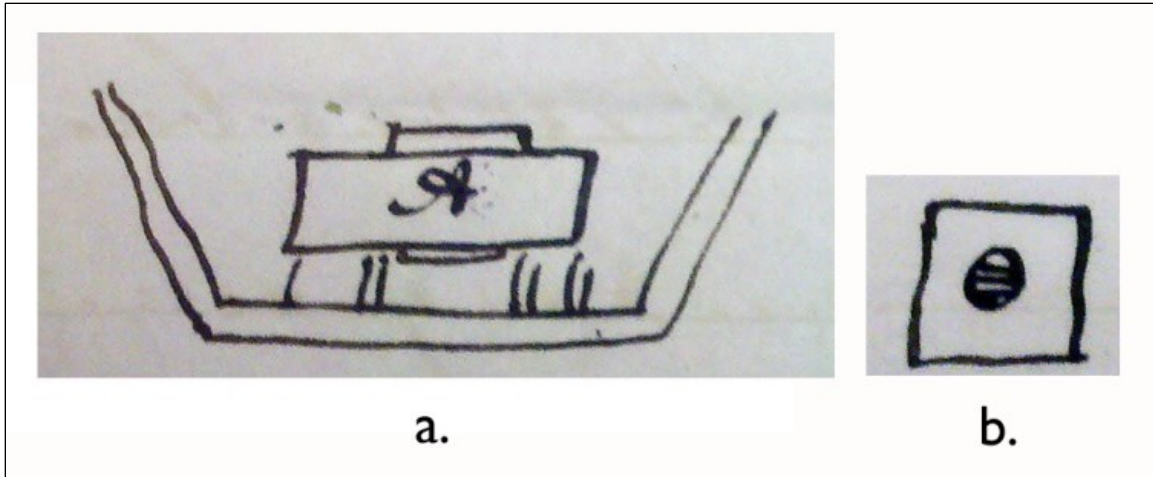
Elisha Mitchell's drawings to illustrate his plan for drains to serve South Building (Mitchell to Swain, 30 December 1844, University of North Carolina Papers #40005, University Archives). The first sketch (a) shows South Building, labeled "A," with short drains extending perpendicular northward from the building to join a larger conduit that discharges to the southeast and southwest. The second drawing (b) shows his conception of a drain cover with grating.
